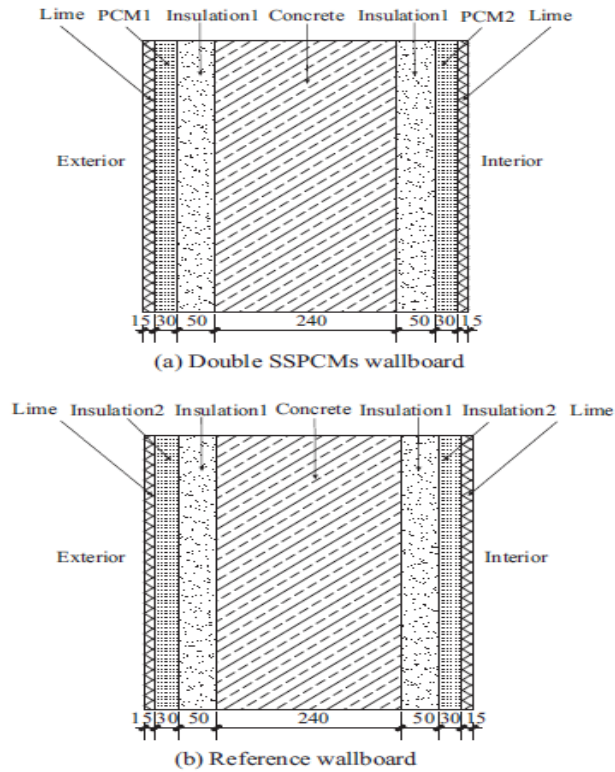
Proposed double layer shape stabilized PCM wallboard (b) Reference wallboard without shape stabilized PCM (263)
